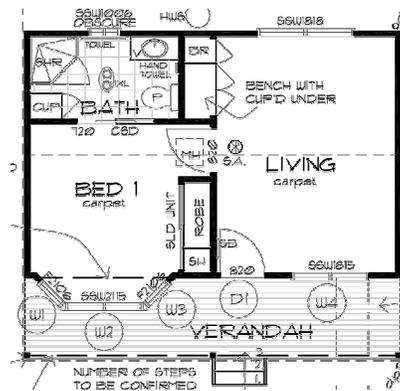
Ground floor plan of case study building (source: VCG 2011)
